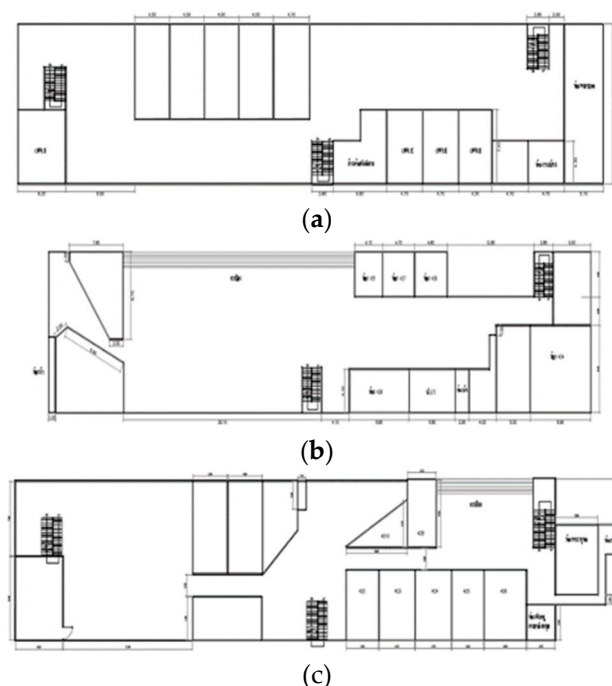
School for the blind building floor plan: (a) The first-floor plan; (b) The second-floor plan; (c) The third-floor plan.
